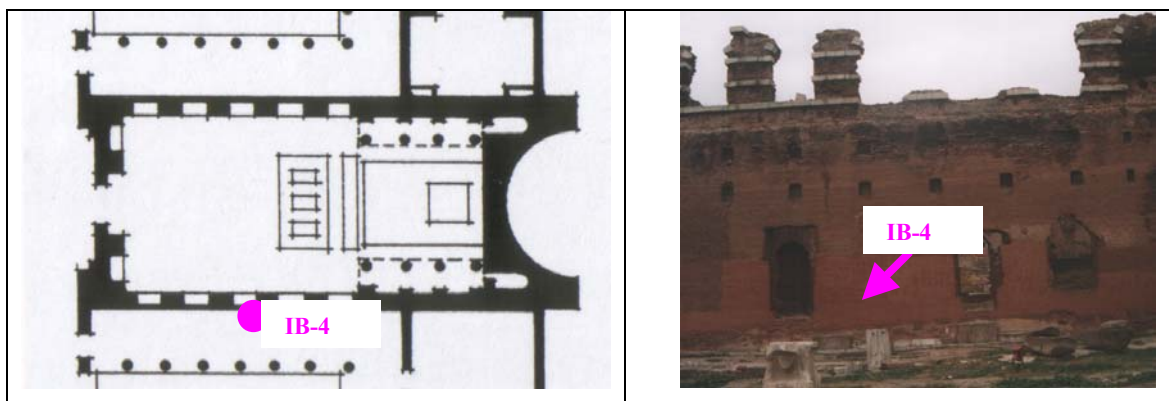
5. Plan of the Serapis Temple (Radt 2002) and view from the south-west elevations (2004) showing where intervention brick sample (IB-4) was collected.
